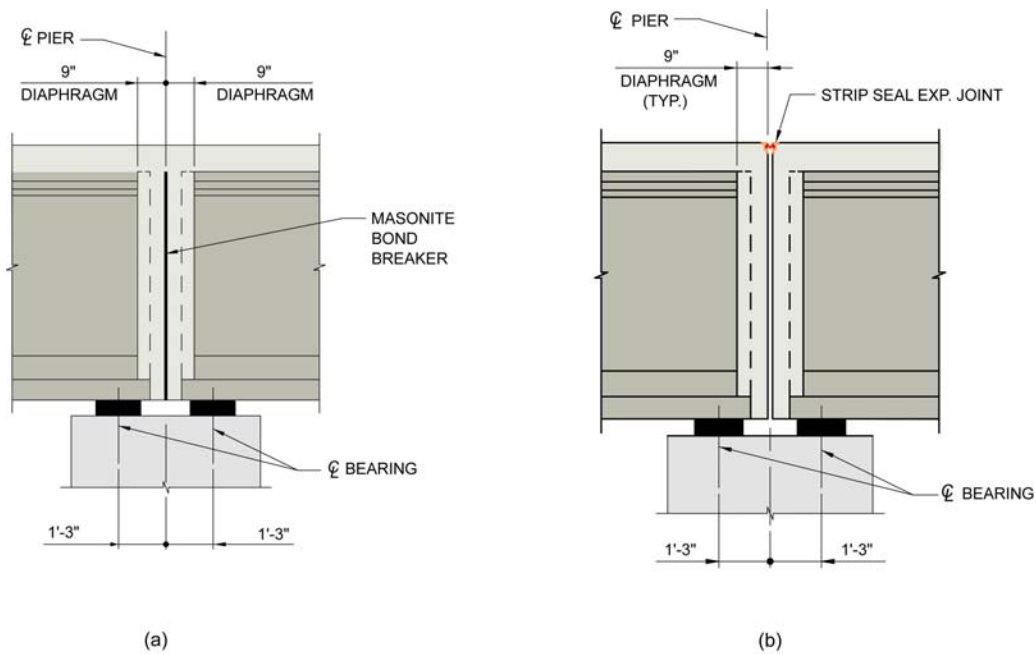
(a) interior pier diaphragm, (b) expansion joint diaphragm
